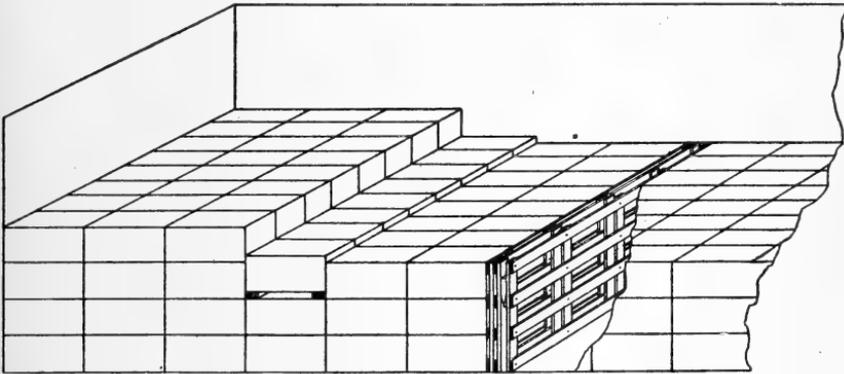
A modern frame used as buffing to fill a large space in doorway of car. Built of 2 by 4's made in 2 sections with struts between.
